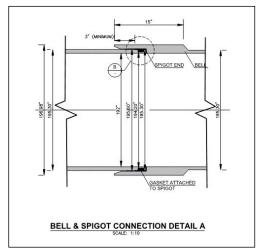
Bell and spigot joint detail for 16-foot ID FRP composite pipe
